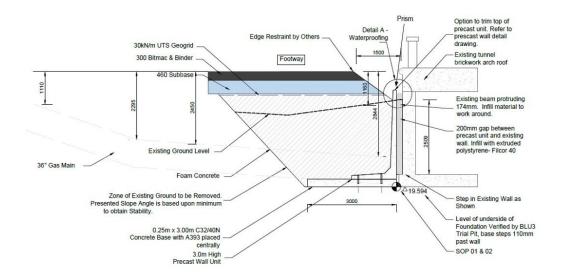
Section drawing showing the proposed works adjacent to the eastern end of Underpass structure.
